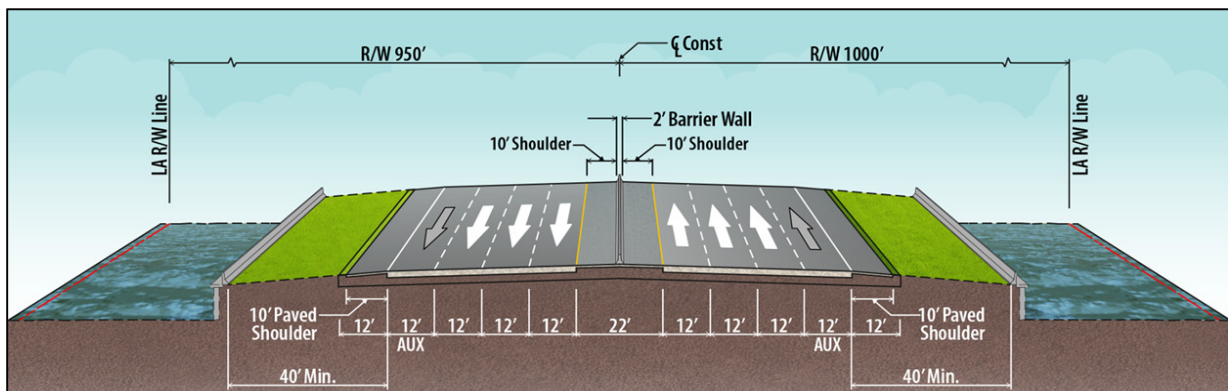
Existing I-275 Mainline Typical Section from south of 4th Street North to 1.0 mile south of Howard Frankland Bridge (Segment C-4)
